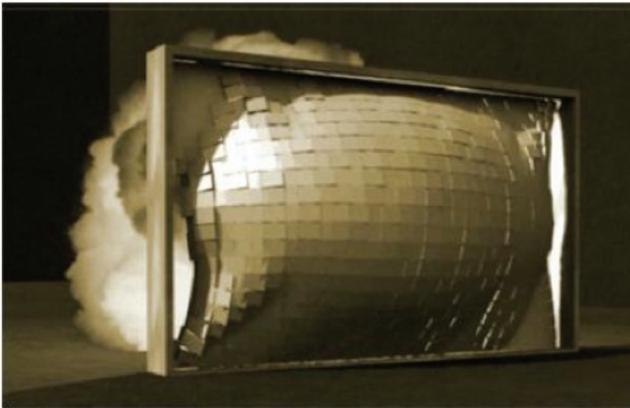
Wall blast debris trapped with elastomeric retrofit material
